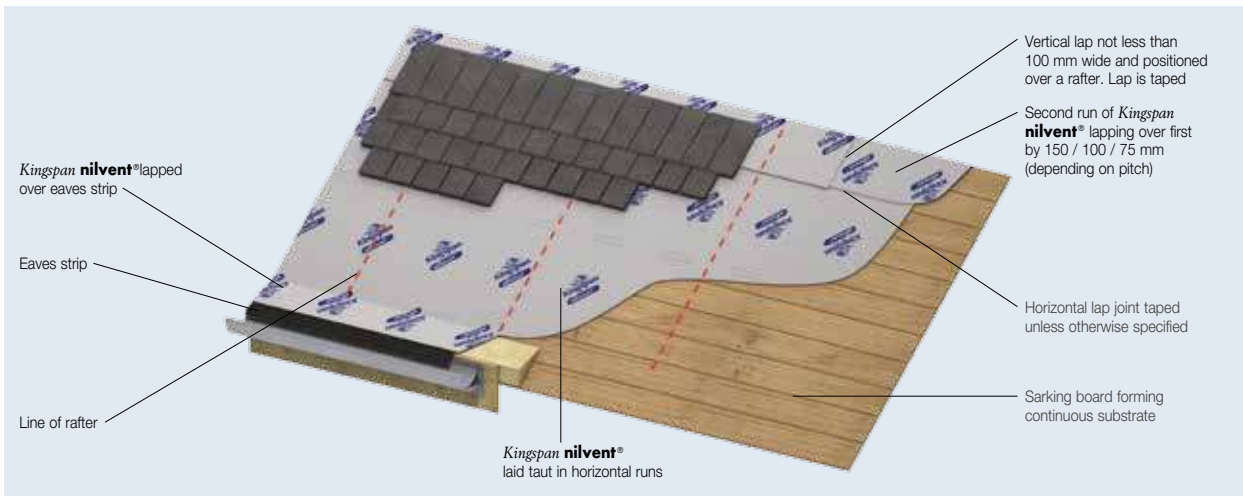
Eaves – Fully Supported Horizontal Installation with Natural Slates
